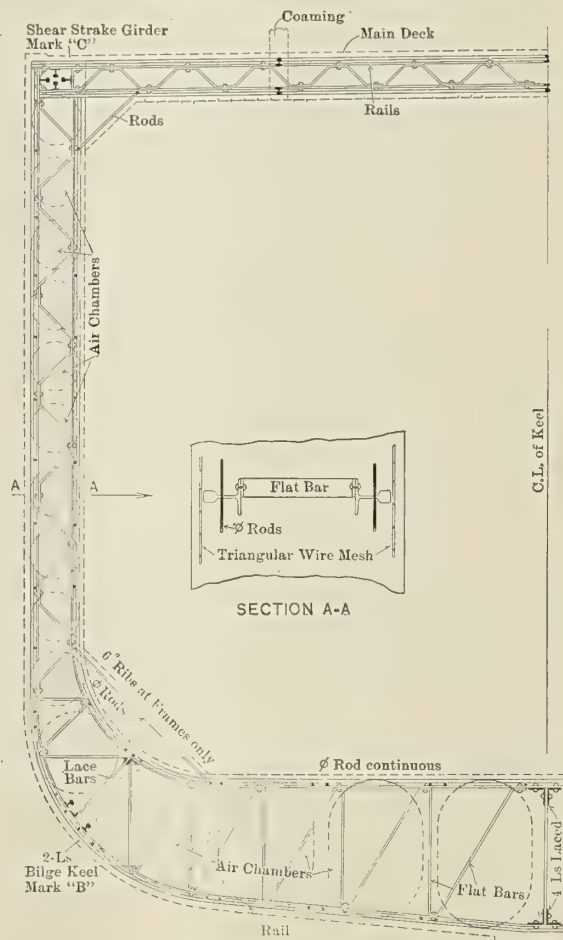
Midship Section, Showing Reinforcing of Frame
